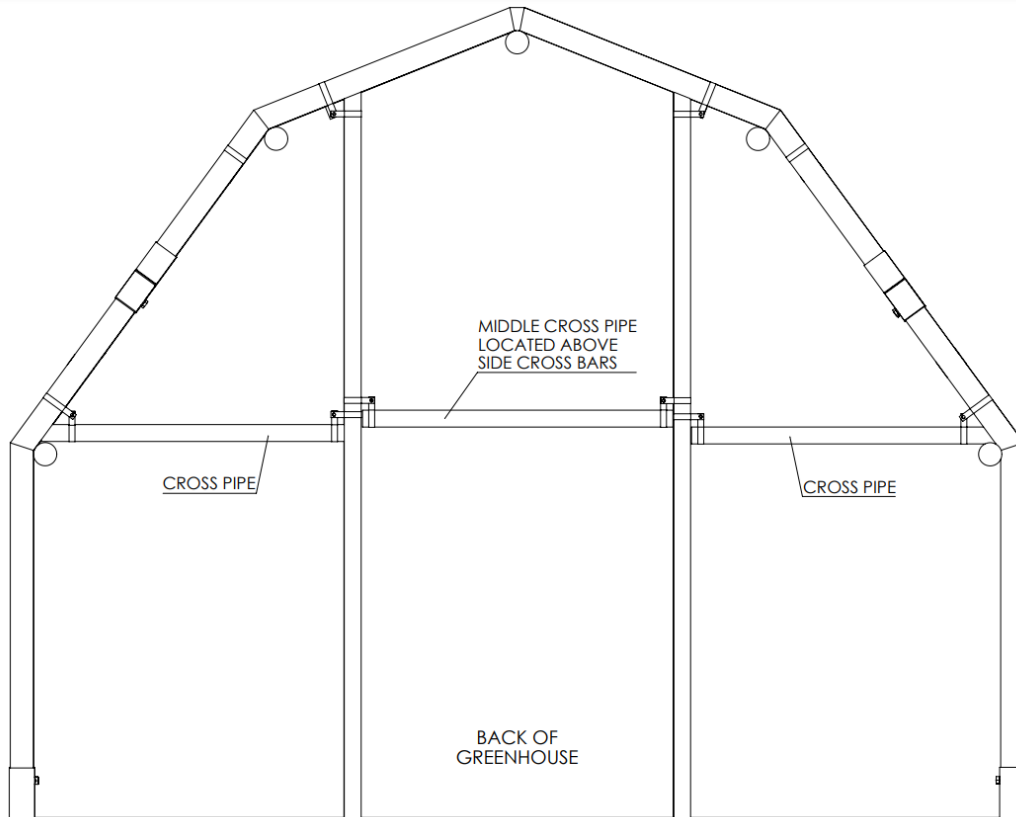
Back view of the greenhouse with installed cross pipes and middle cross pipe.
